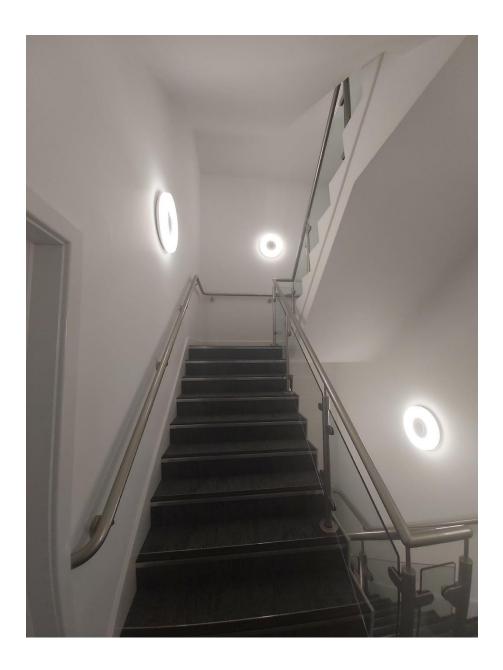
Staircase leading to some of the workshop room lit with a Recessed Led Circular Dali Dimmable Downlighter Lighting Fixtures (Percy Shaw House Building).
